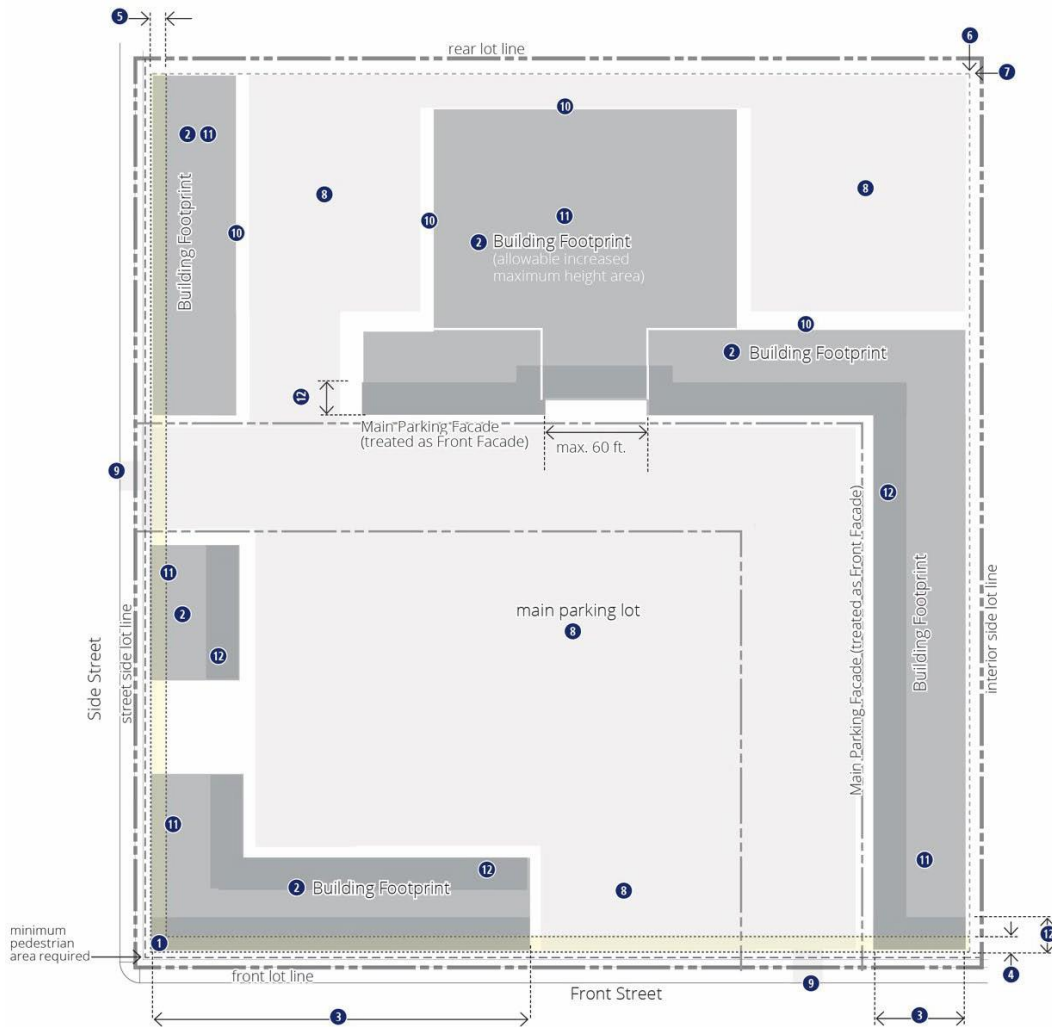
(2). CMU district diagrammatic plans and elevations.
